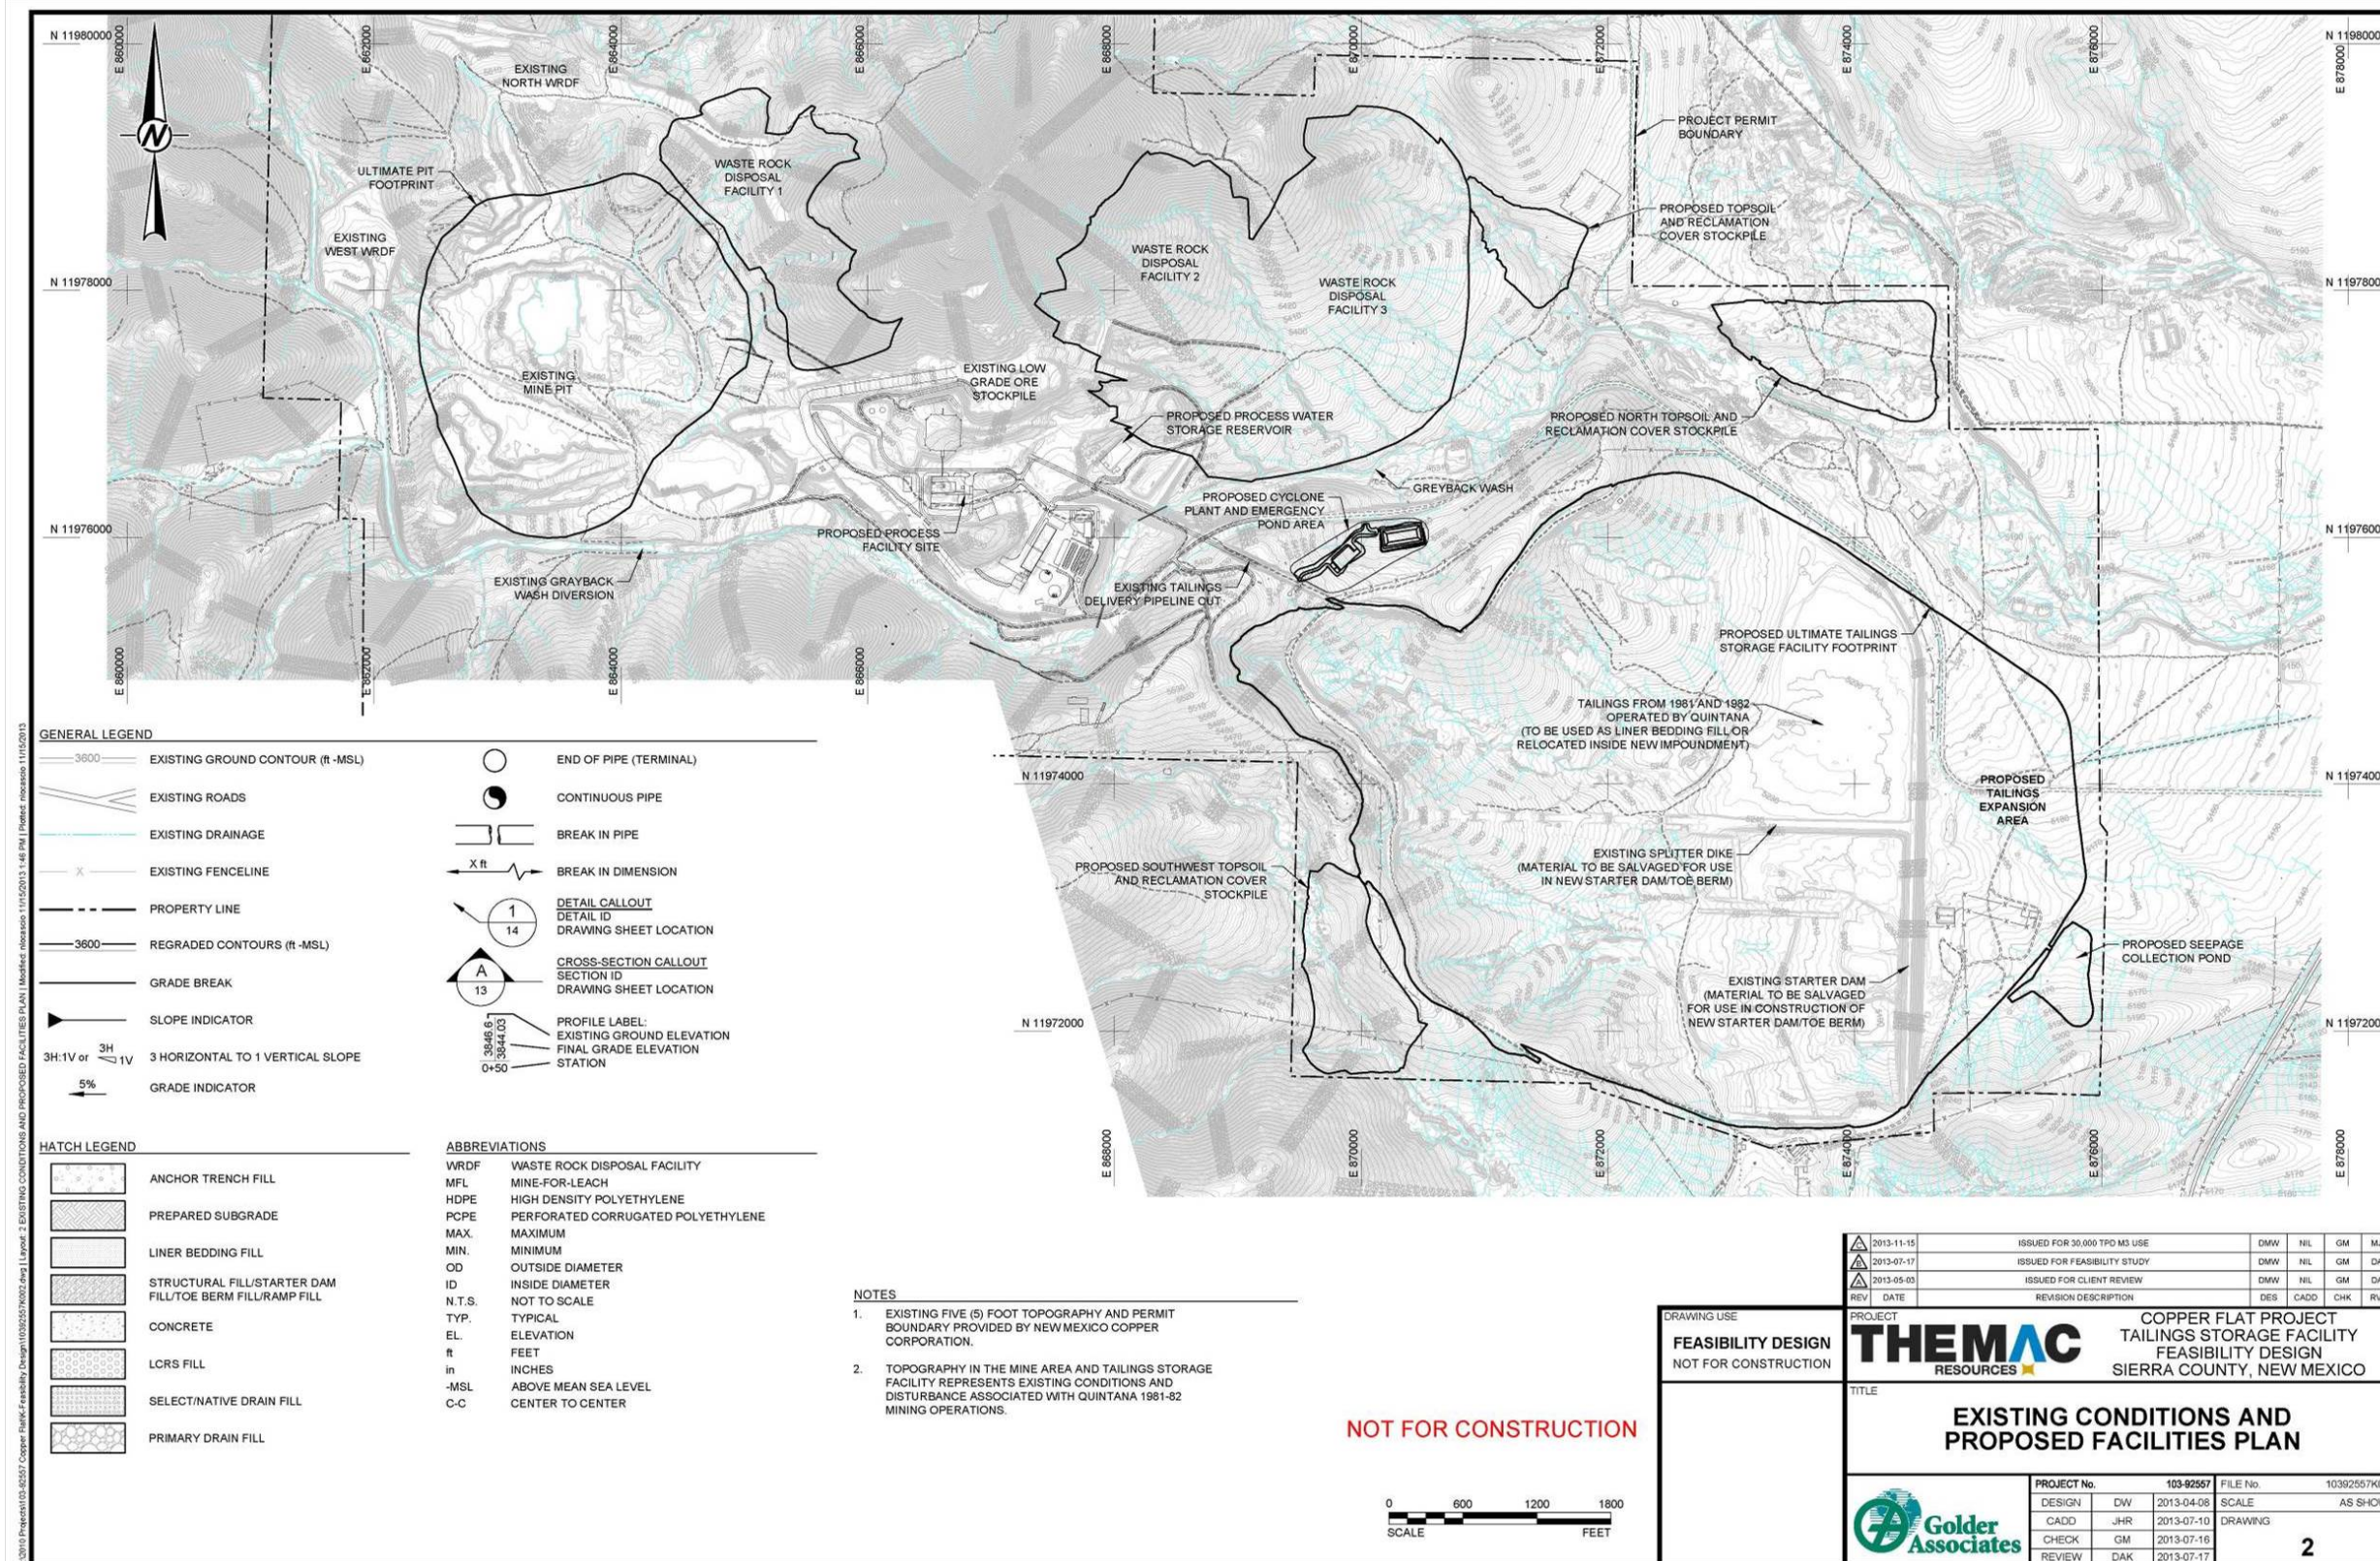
Existing Conditions and Proposed Facilities Plan
